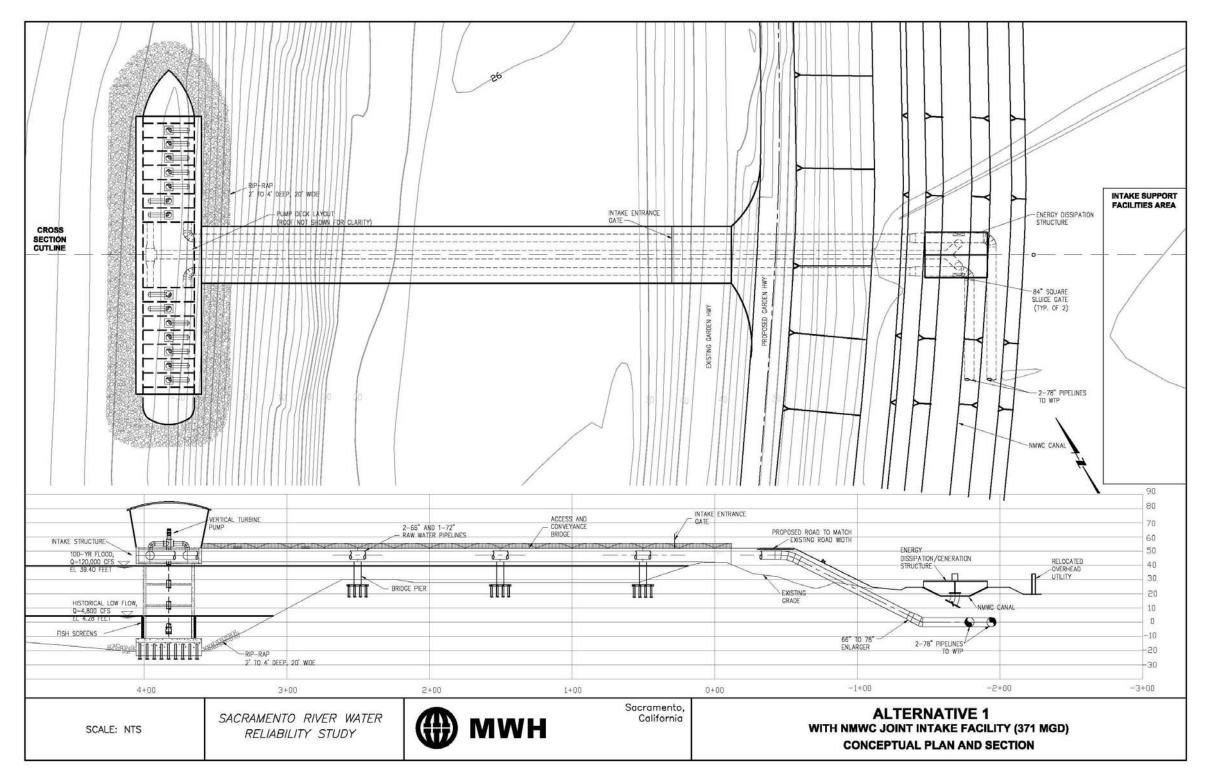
Alternative 1 with NMWC Joint Intake Facility
